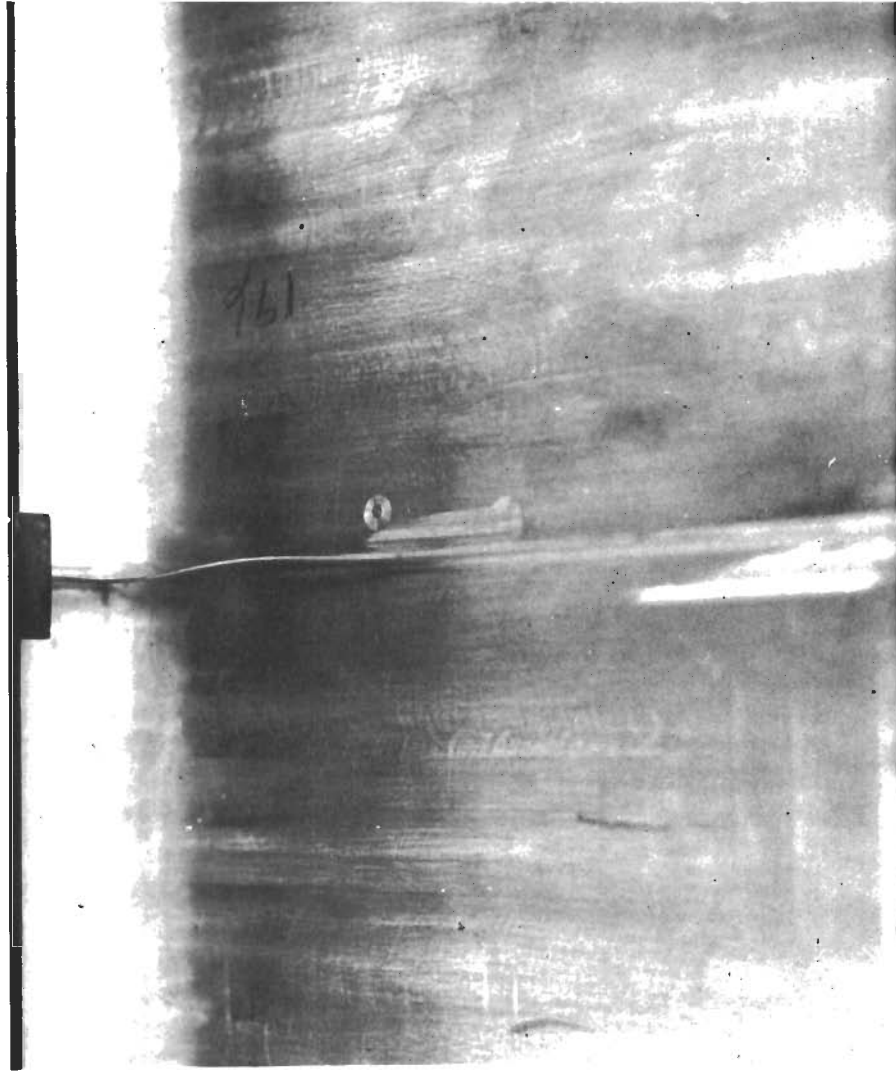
Buckling of Longitudinal Stiffener in Model No. 1, Transverse Loading.
